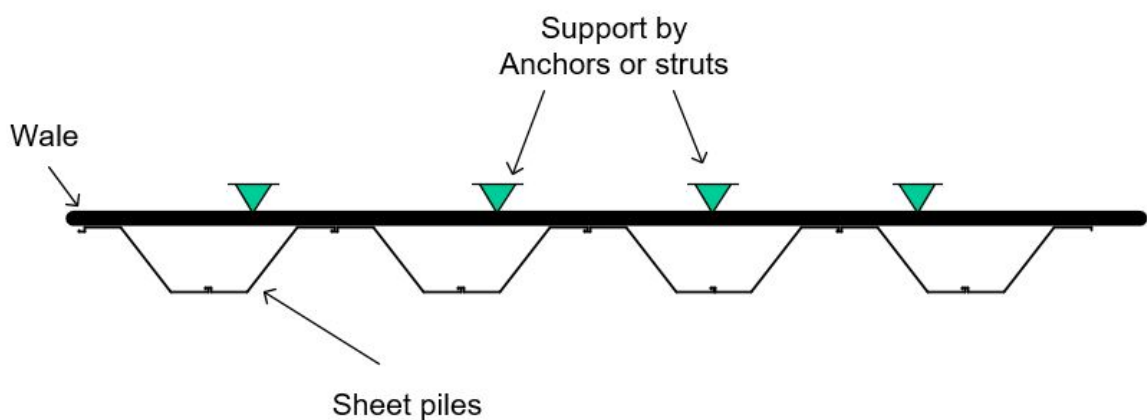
Structural scheme of waling and horizontal support (top view)
